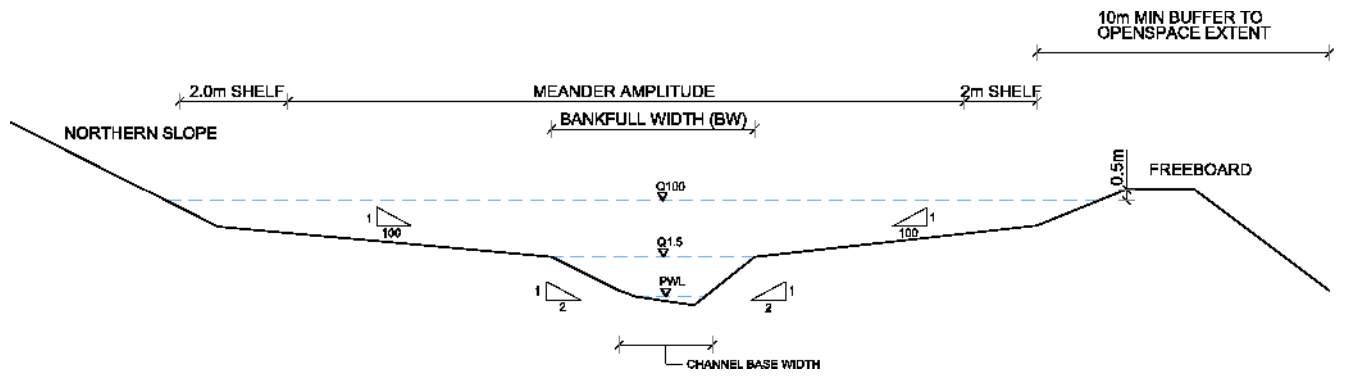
Typical section of the northern realignment in terms of flooding profiles
